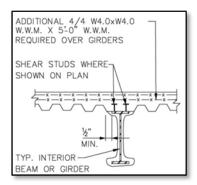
Typical Floor Construction, Metal Deck Parallel to Beams or Girders
